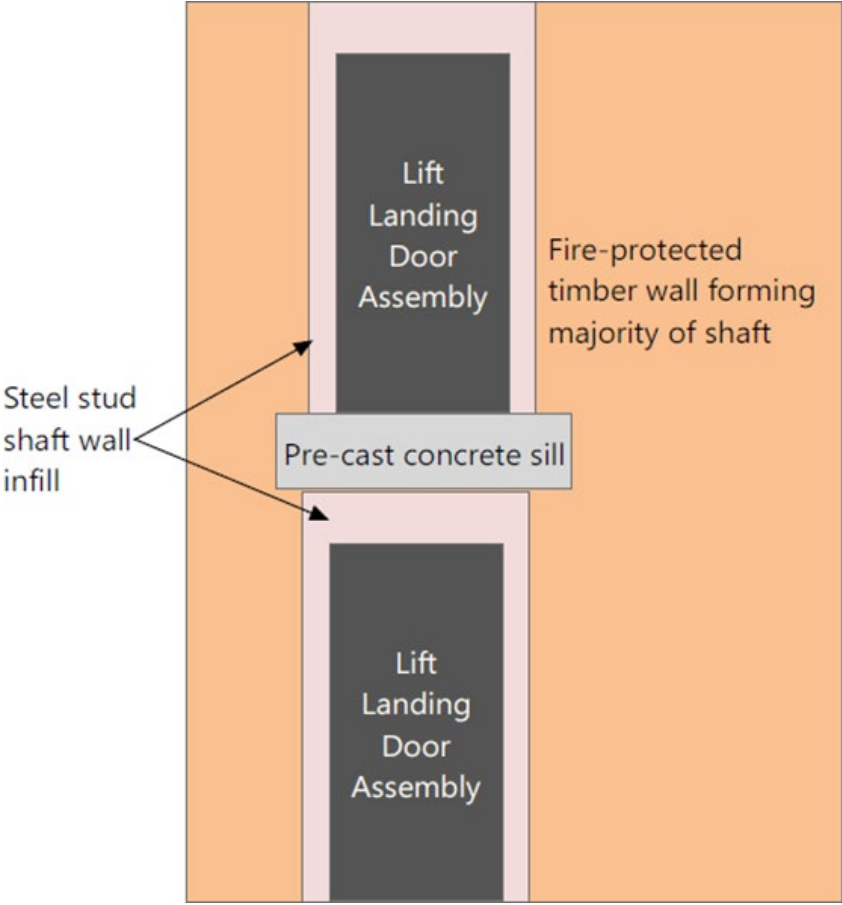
Fire protected timber wall to lift landing door interface – Elevation section view
